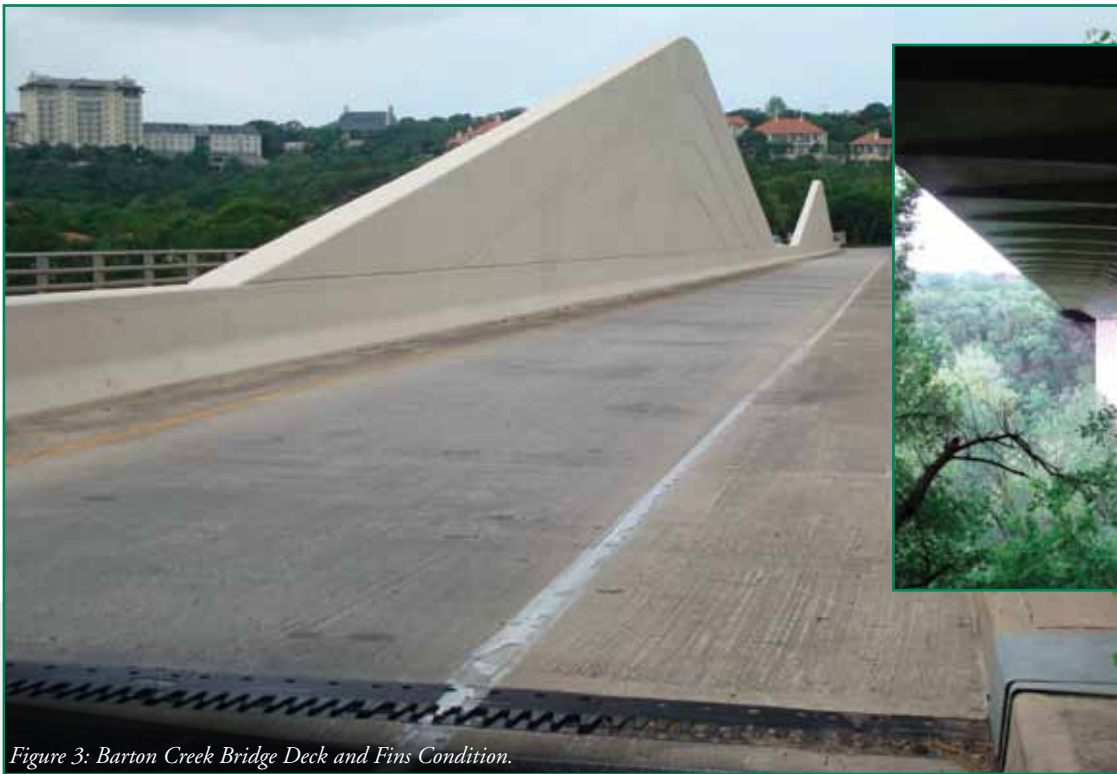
Barton Creek Bridge Deck and Fins Condition.
